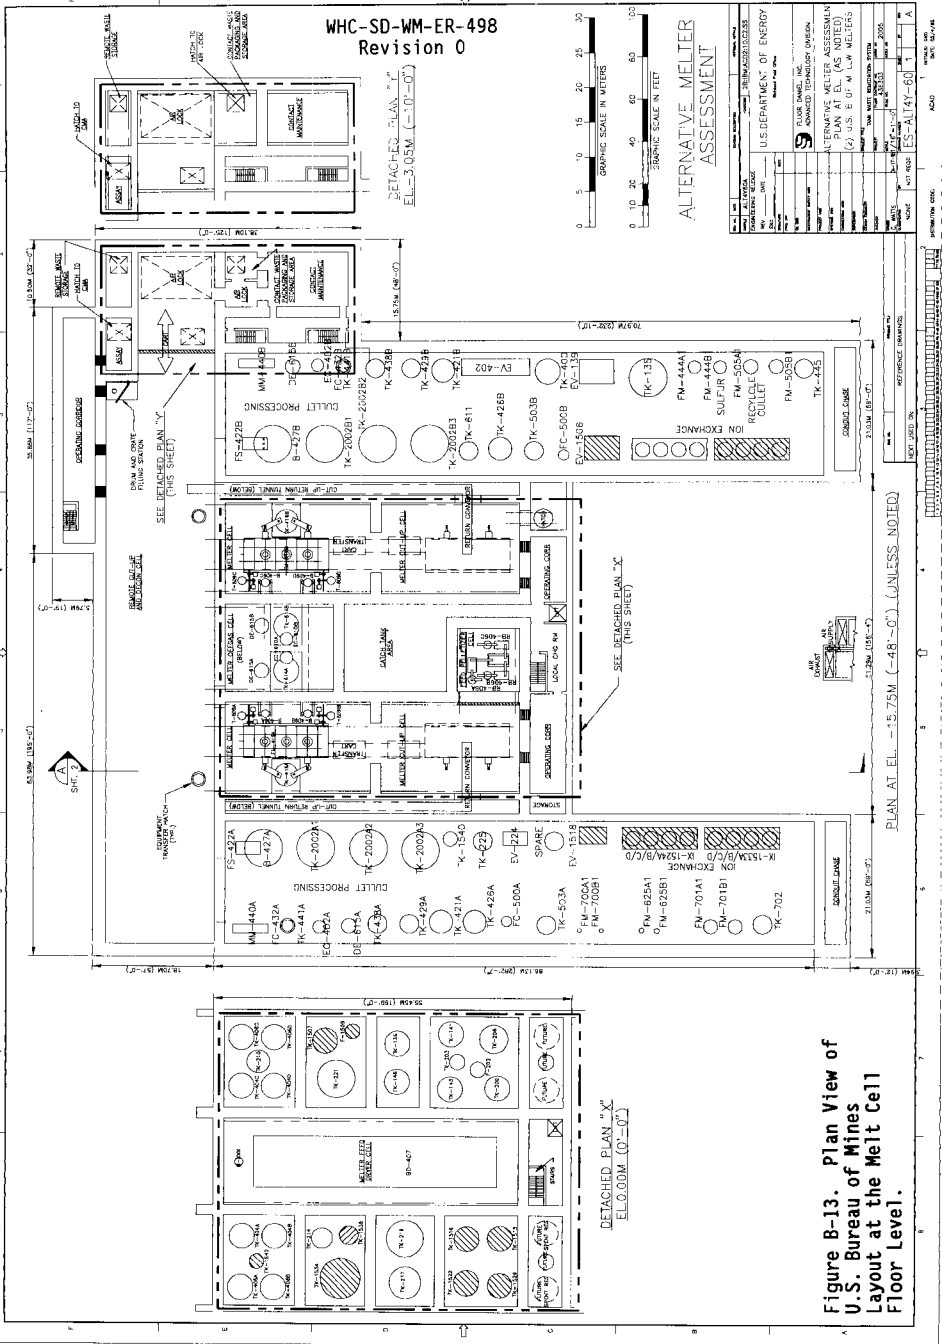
Plan View of U.S. Bureau of Mines Layout at the Melt Cell Floor Level.
